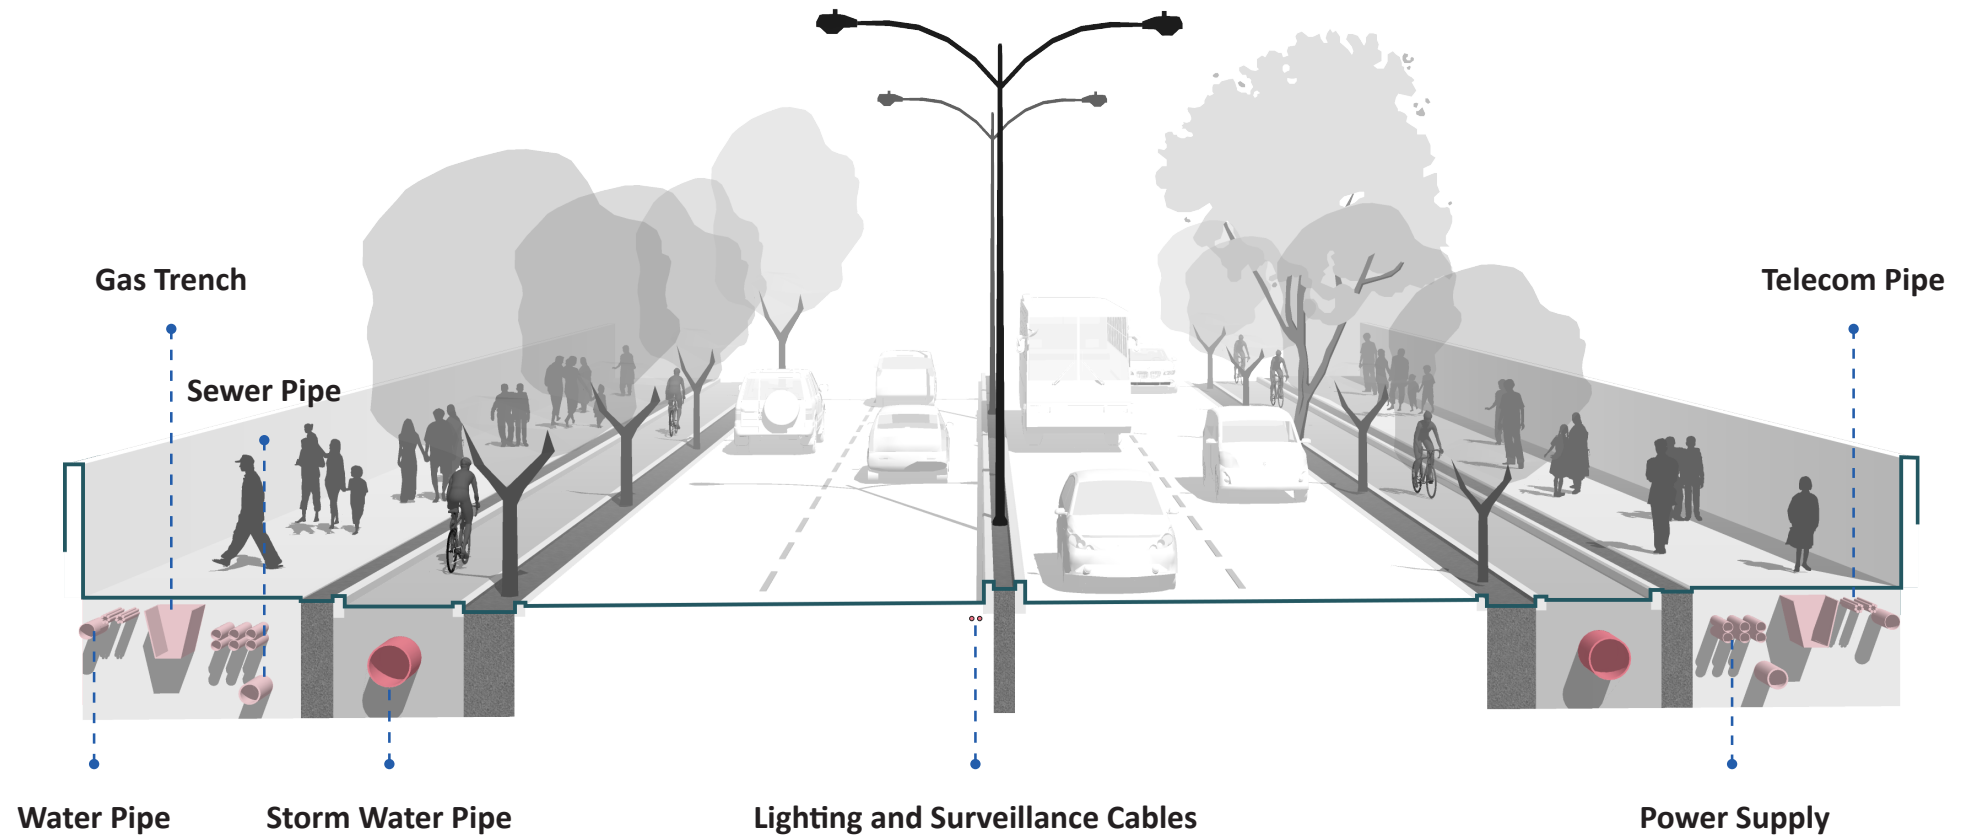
A typical cross section showing the organised underground utilities within the R.O.W, beneath a CM GRIDS road.
